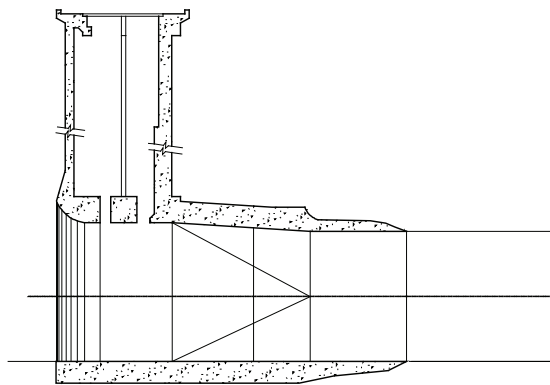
Typical inlet to a diversion tunnel.
